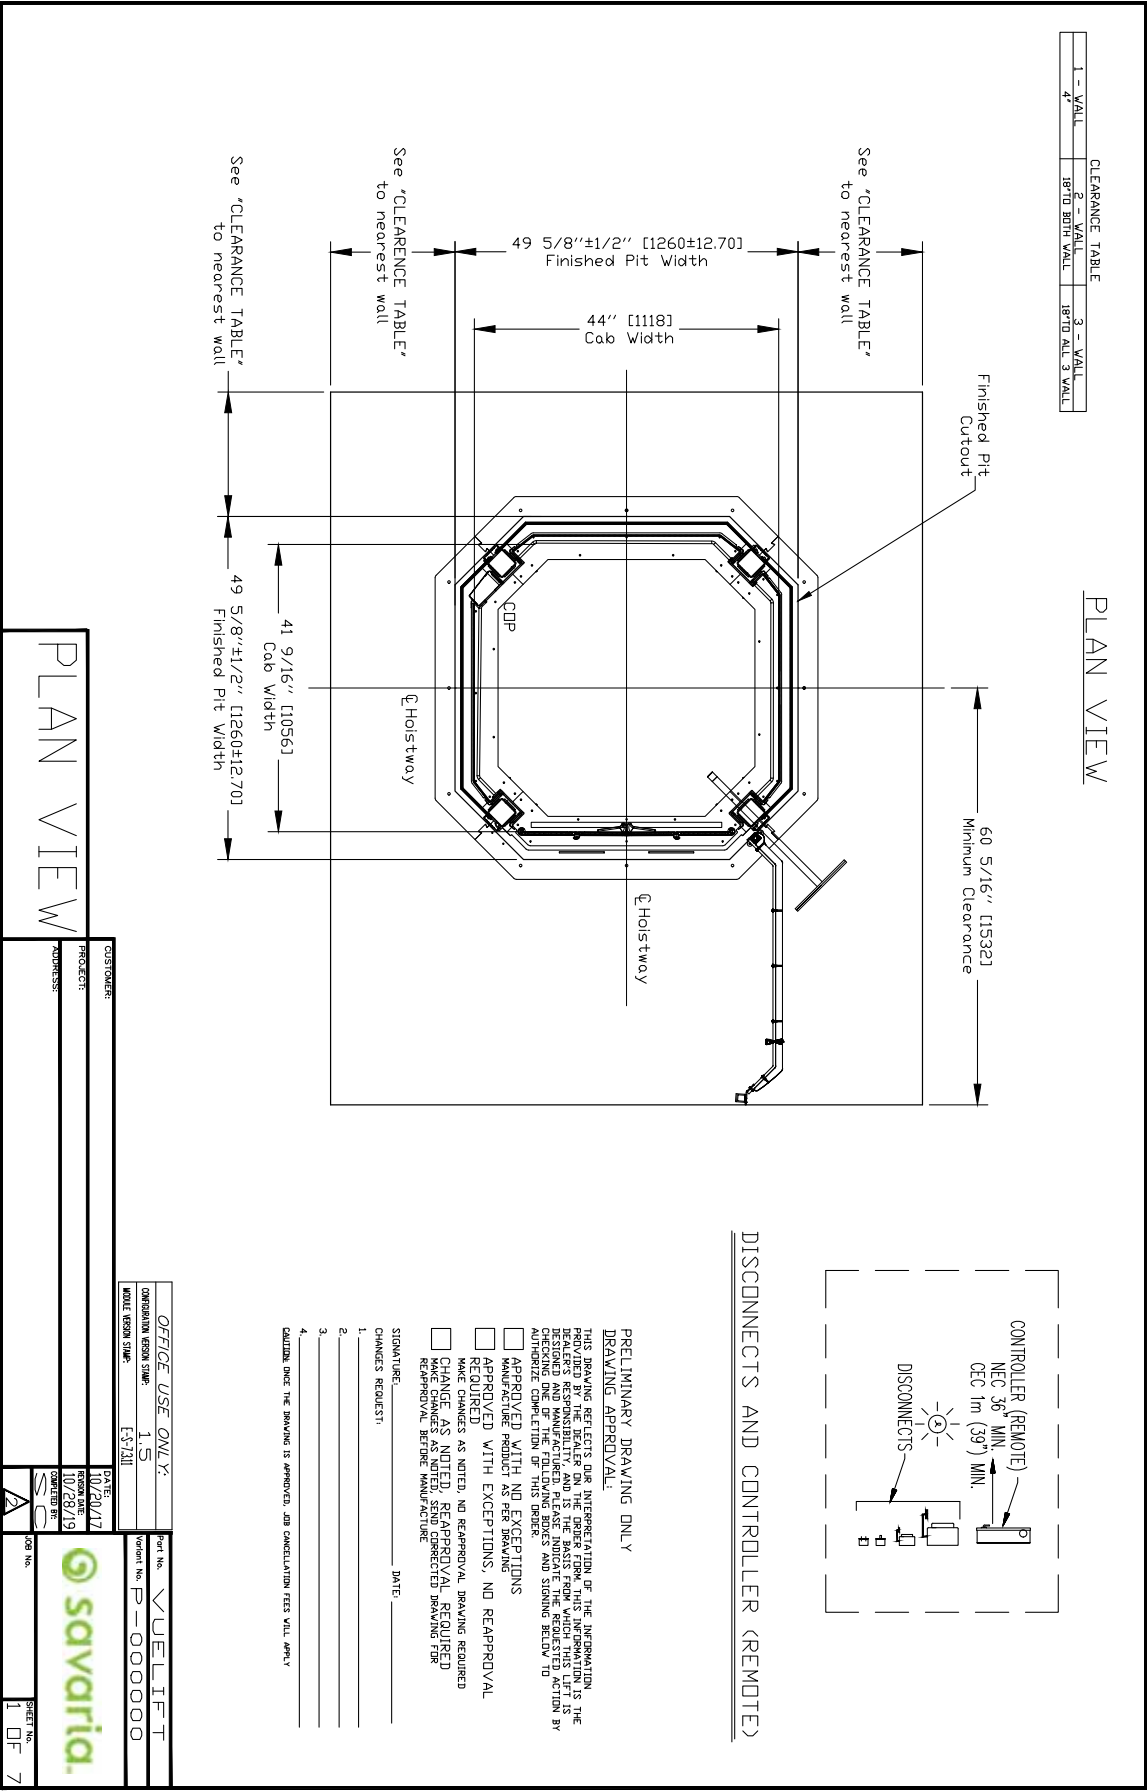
Pit/bottom floor/thru-floor view (OAM, type 1)
